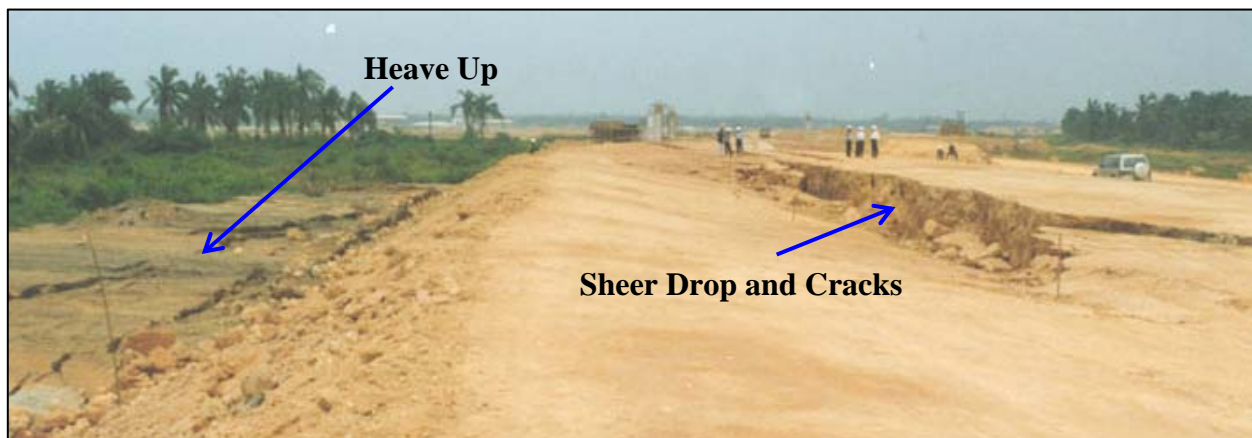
Failure of Embankment A treated with Stone Columns (After Gue & Tan, 2004)
